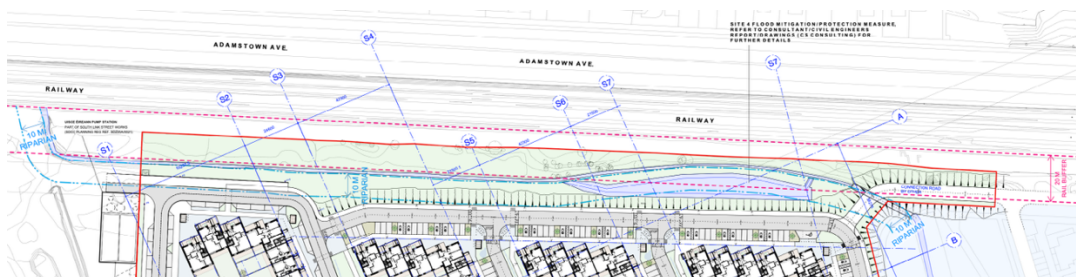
Extract of Site 4 Proposed Site Layout Plan: KSG4-DTA-00-SP-DR-A-1000
